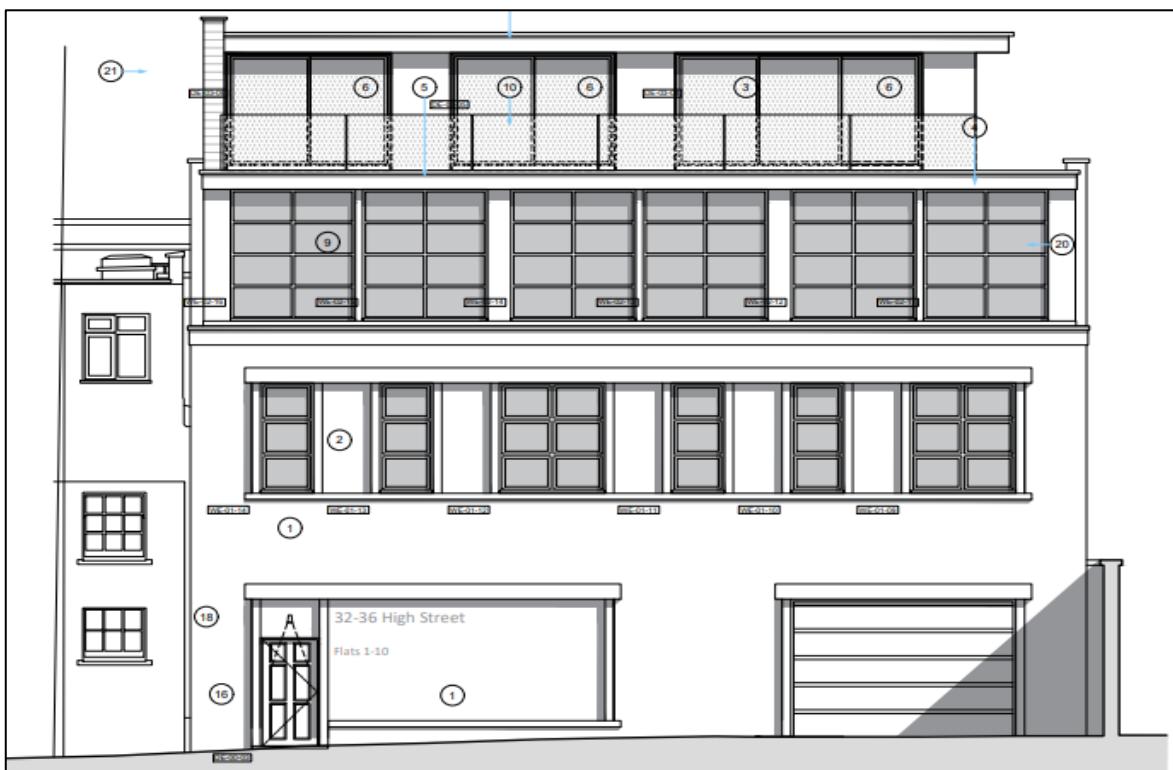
AWDM/0821/20 Approved Elevation from Marine Place
